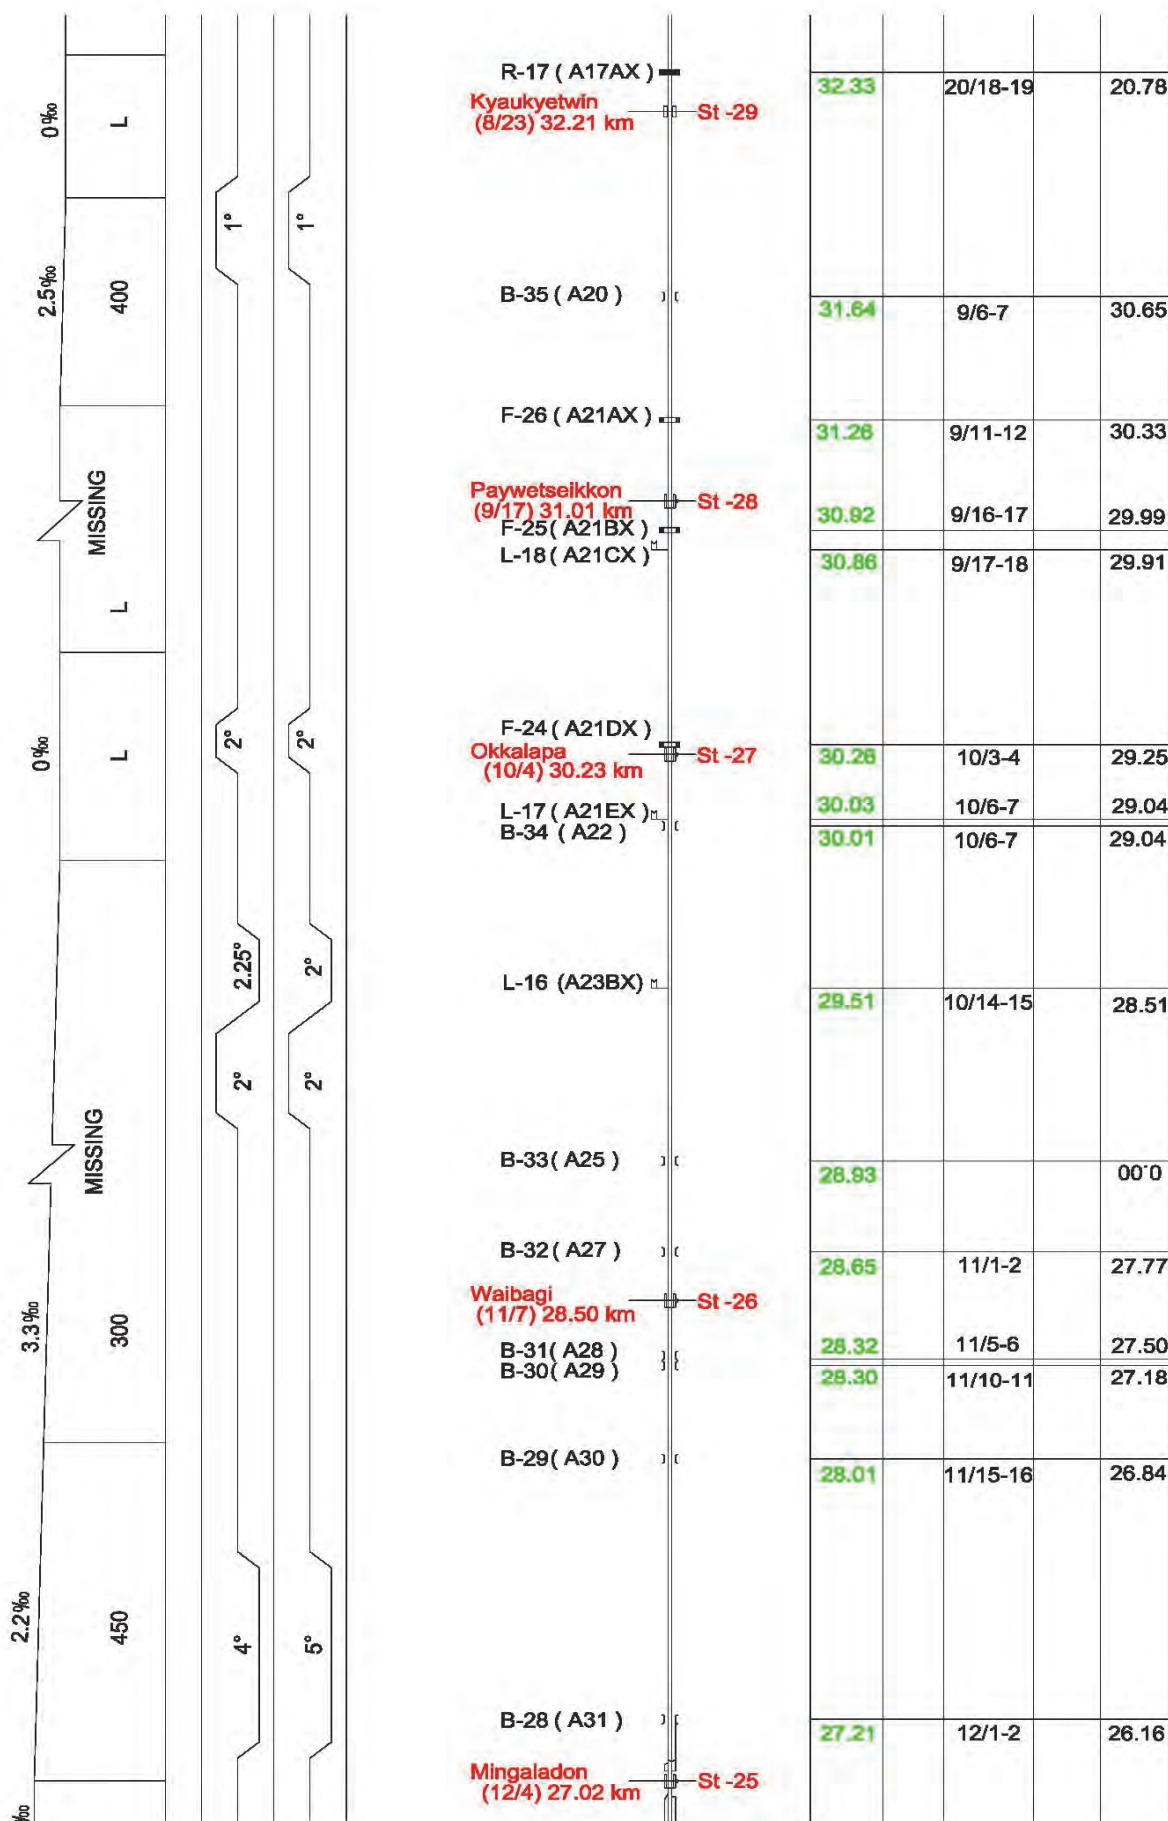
Schematic Sketch on Existing Yangon Circular Railway (6/9)
